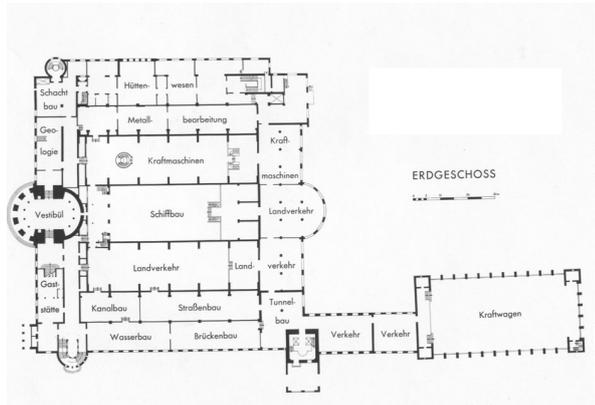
(left): Ground Floor Plan of the Collection Building; (ABDM-BN_36545)
